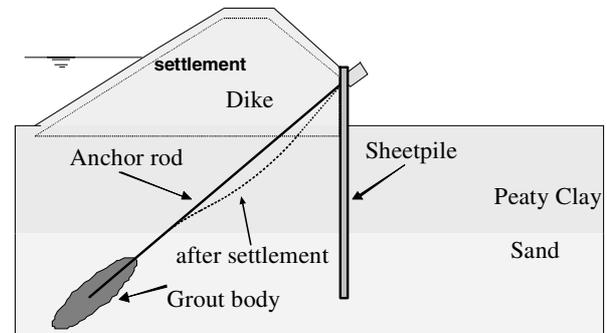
Sheet pile construction stabilized with grout anchor for dike-strengthening projects
